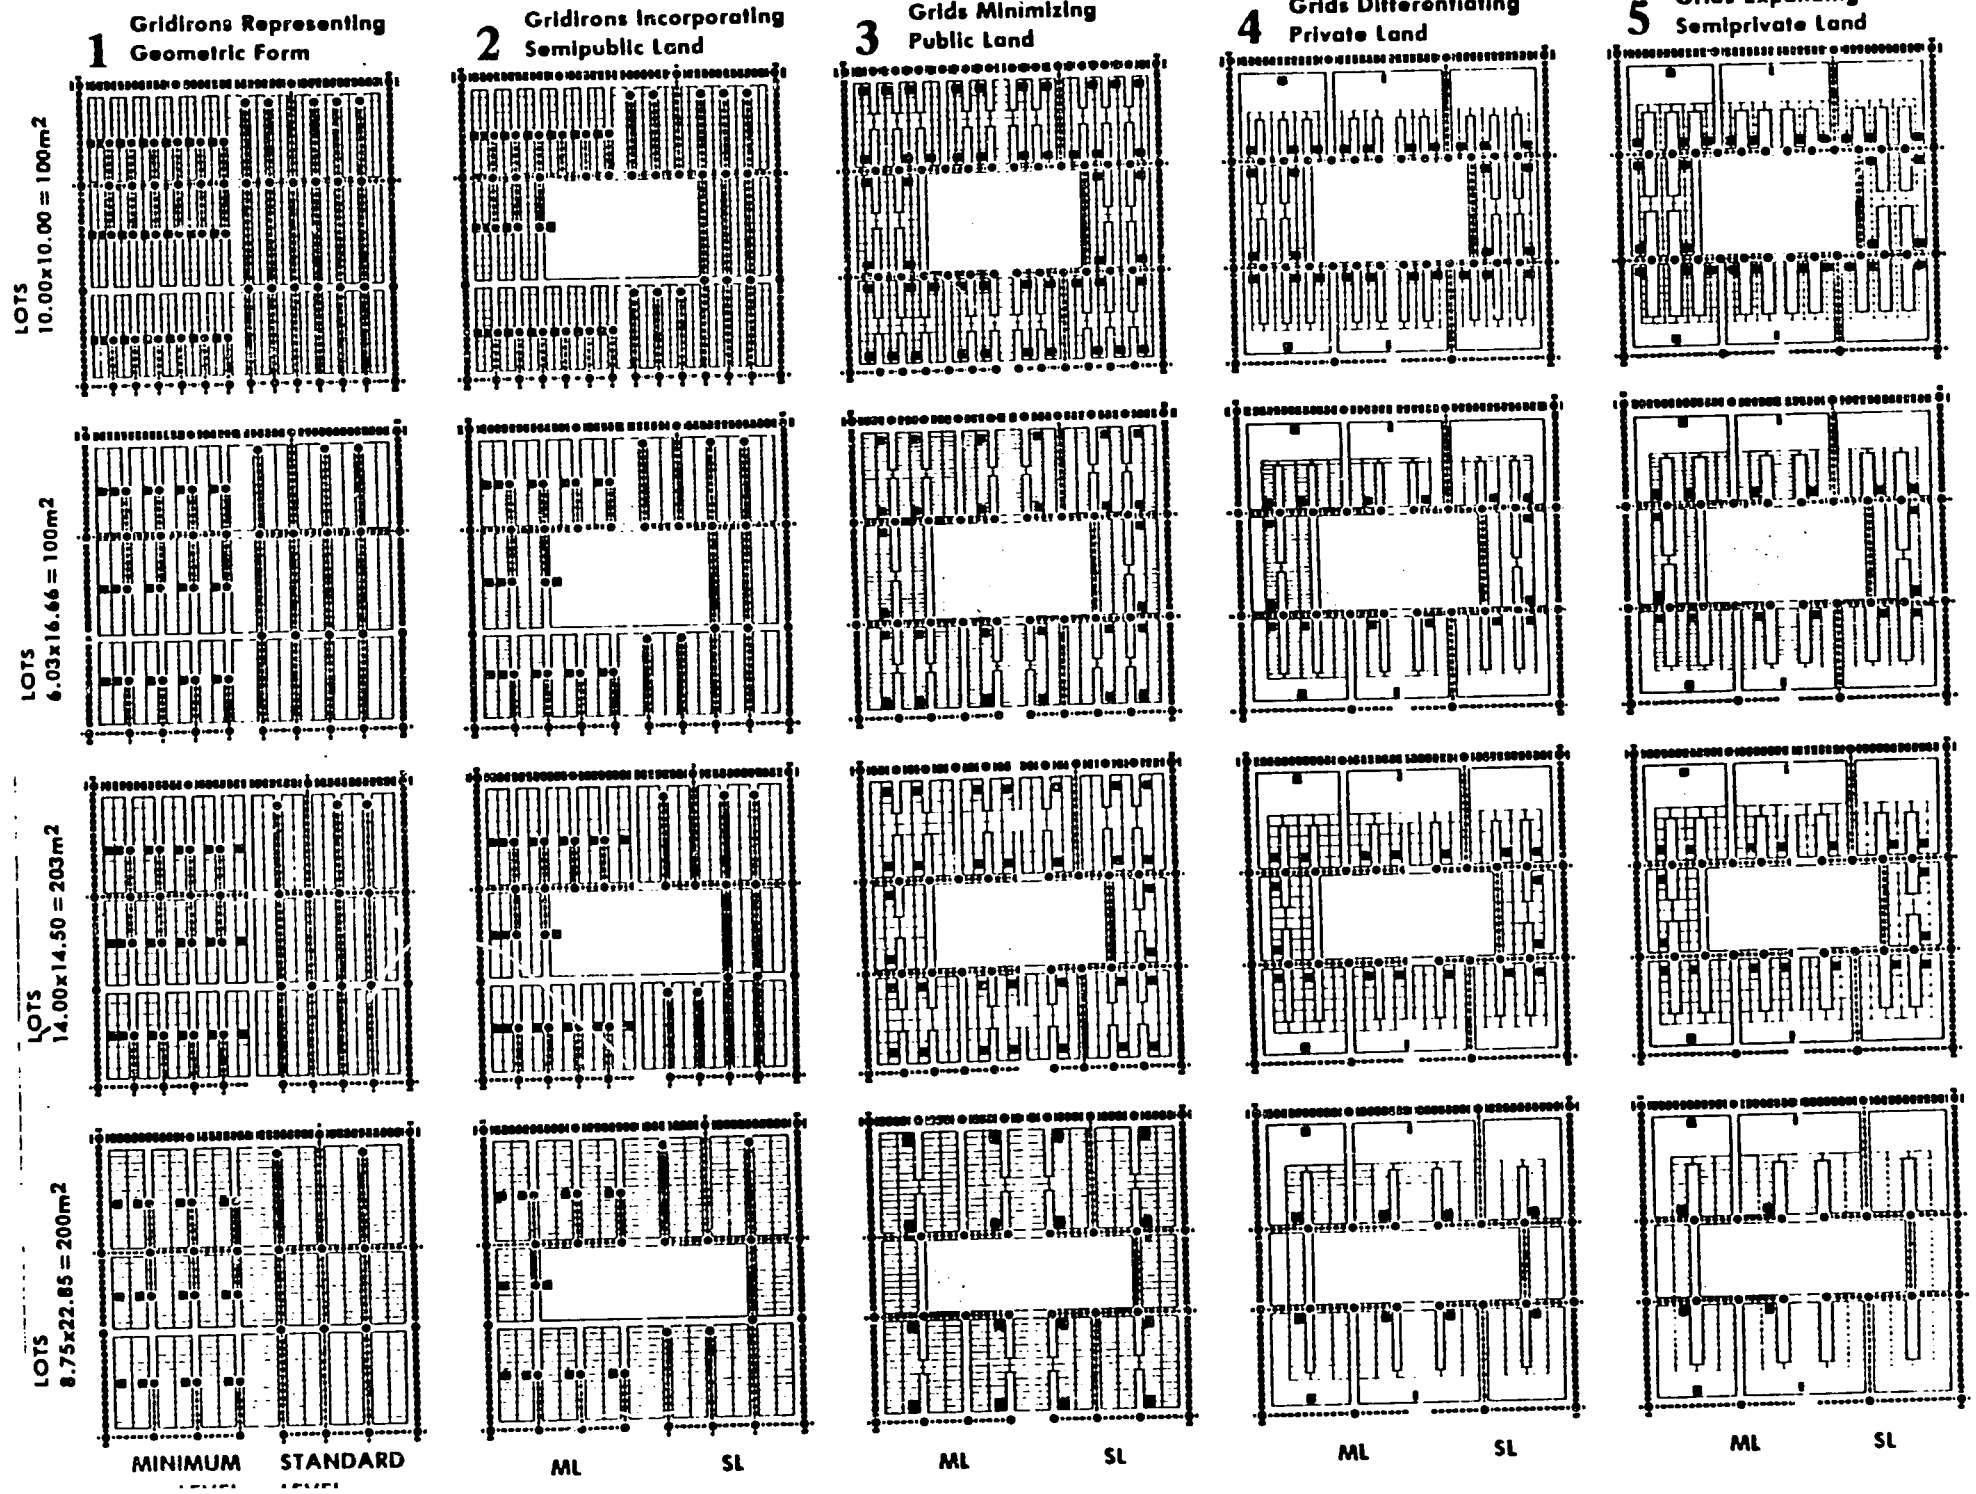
(opposite page): SEWAGE DISPOSAL LAYOUTS FOR THE 20 REFERENCE MODELS. They are arranged as follows: horizontally, the four types of lots; vertically, the five layouts. Each plan is divided to show minimum and standard levels of service. Scale 1/10,000.
